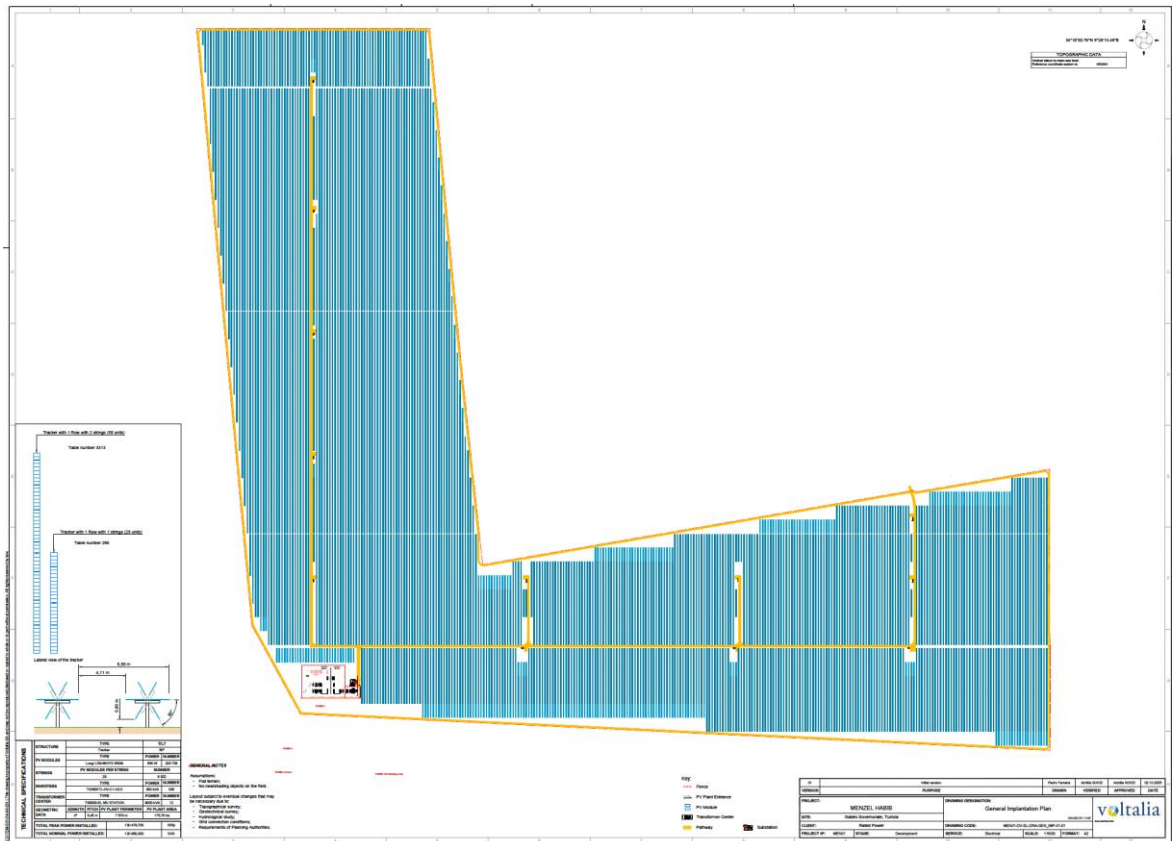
Layout plan for the 175-hectares of the solar PV plant
